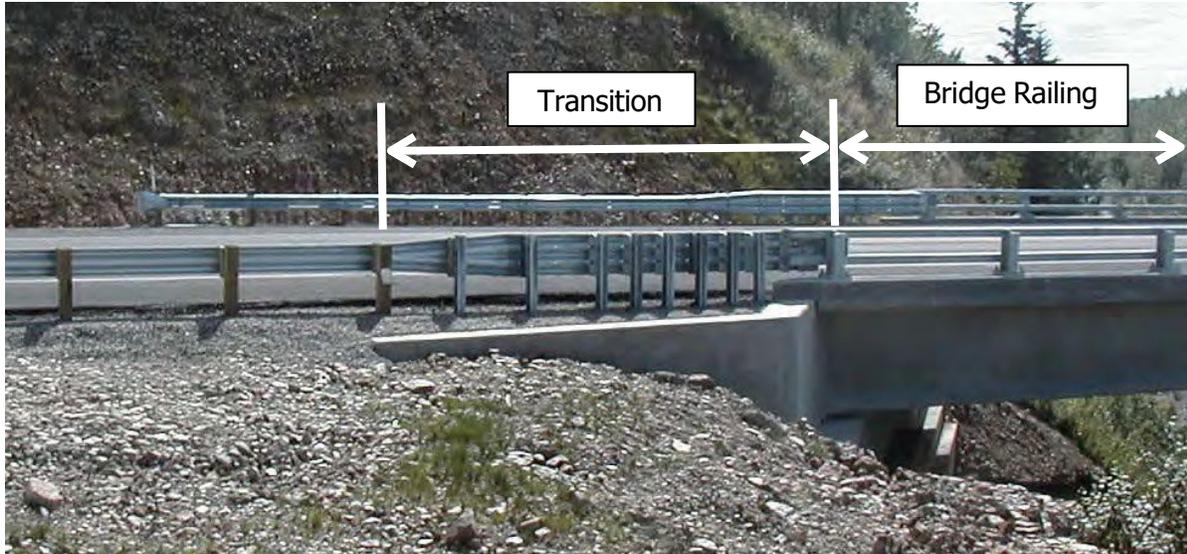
Metal bridge railing and transition. (Source: Alaska DOT)
